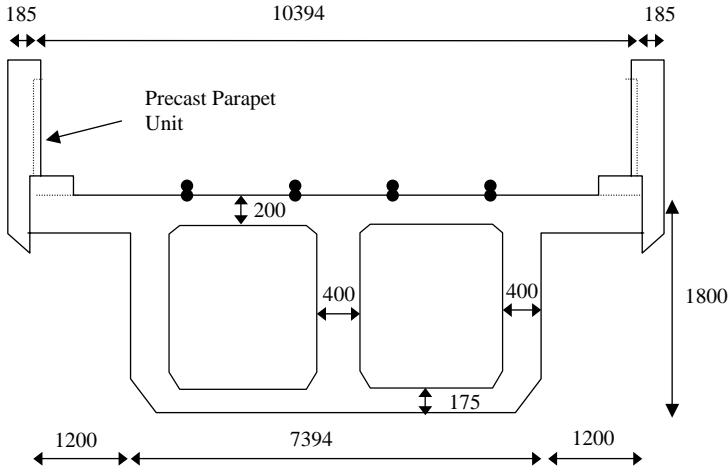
Dimensions of the concrete railway viaduct (measured in mm) and span is 40 m (not in scale).
